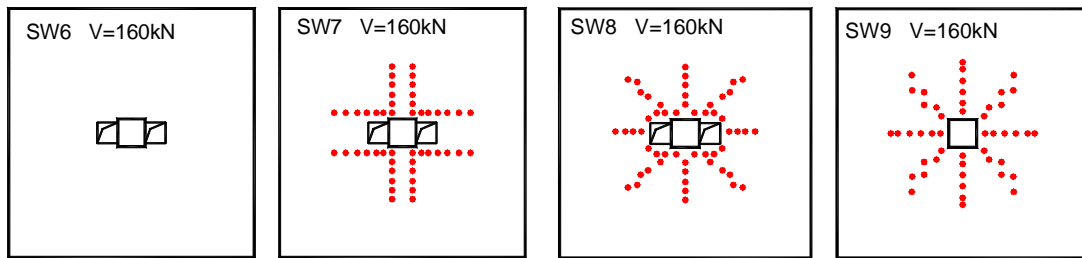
The four specimens (SW6~SW9) of Series II and shear bolt layout.
